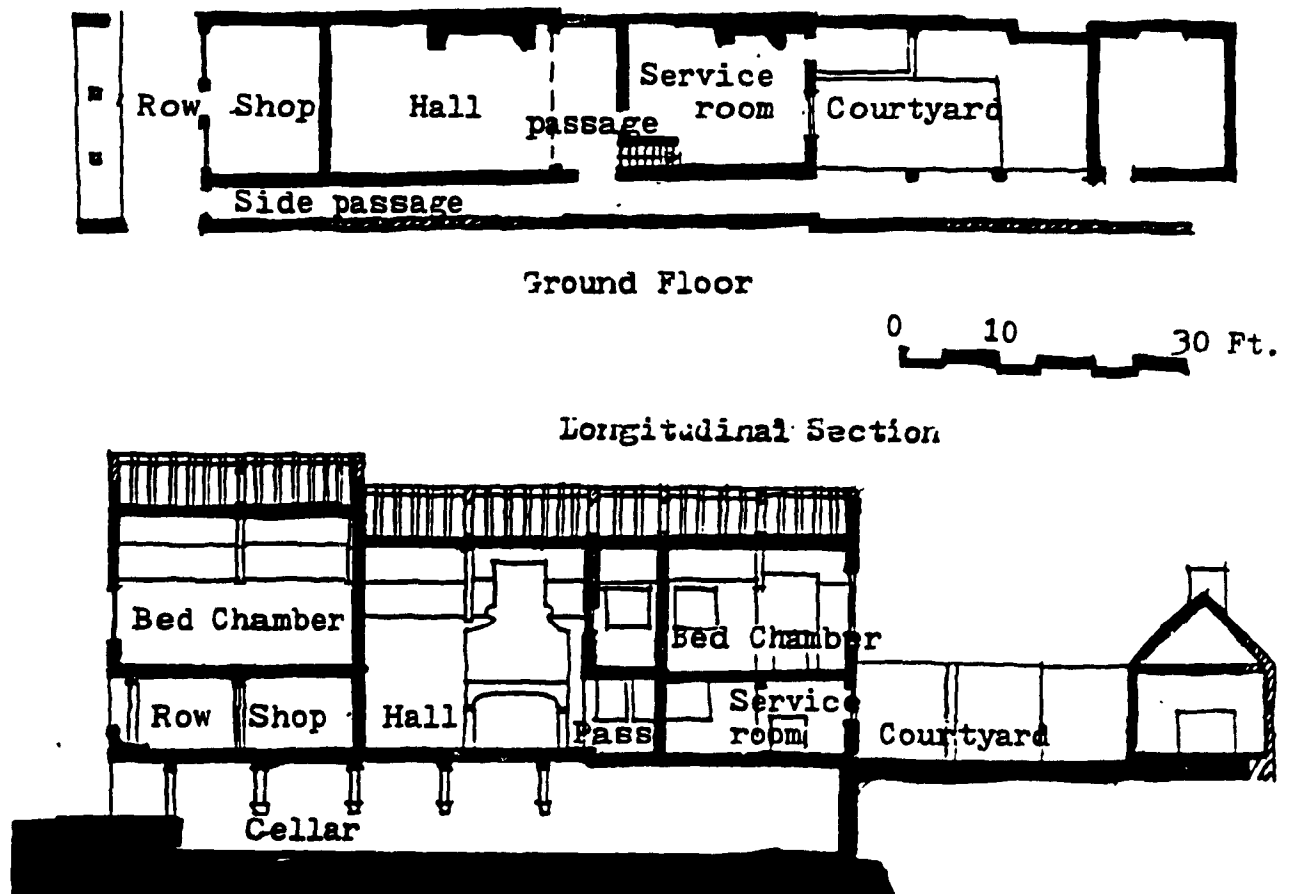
Plan and Section of an arcaded merchant's house : Leche House on Watergate Street in Chester, England.
